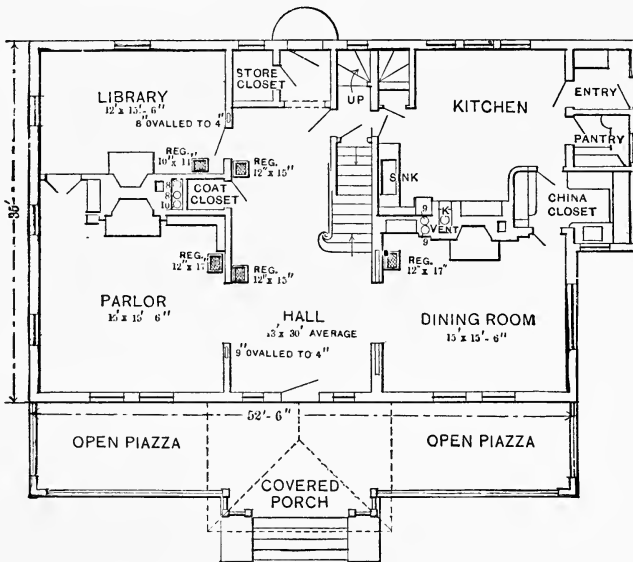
First-Floor Plan (10' 0") of a Residence Heated by a Furnace System.
